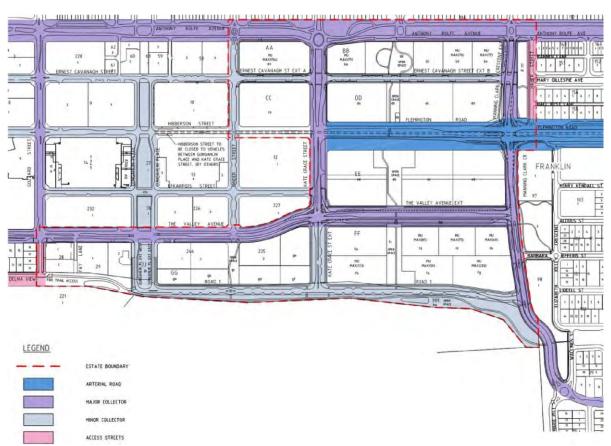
Road Hierarchy Plan (Indesco, 2016)
